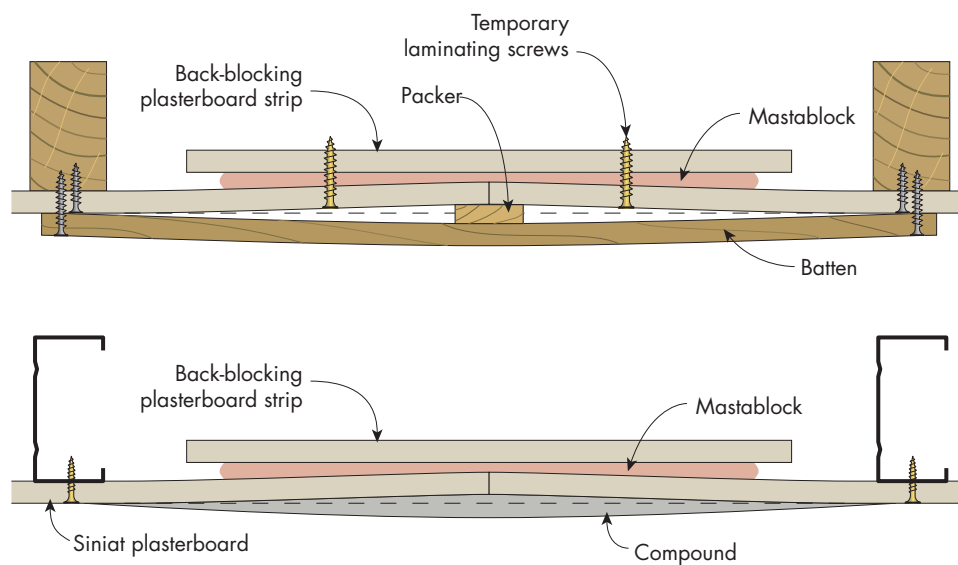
Creating a Recess on a Ceiling Butt Joint using Back-Blocking Battens
